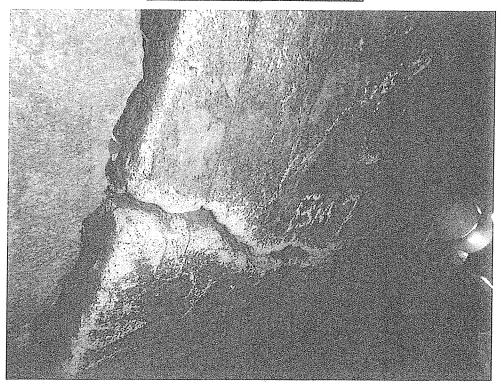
Slab 7-Full width transverse crack ranging from 3/4" to 2" wide.
